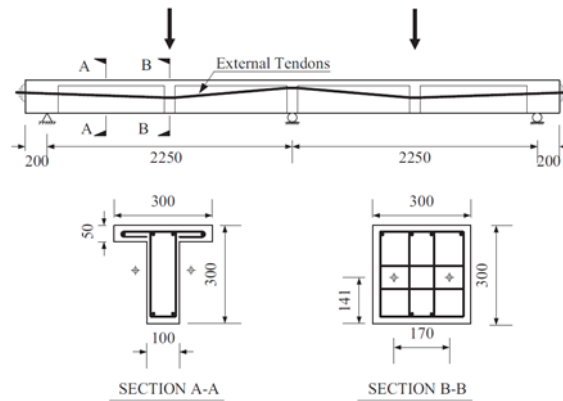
Dimensions of test specimens by Chan at HKU (mm)
